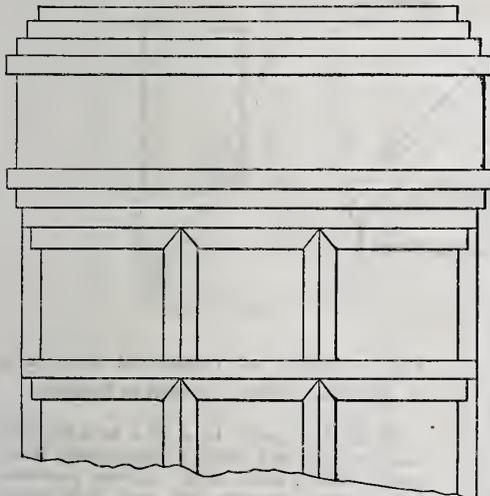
Elevation of Chimney.—Scale, $\frac{1}{2}$ Inch to the Foot.
